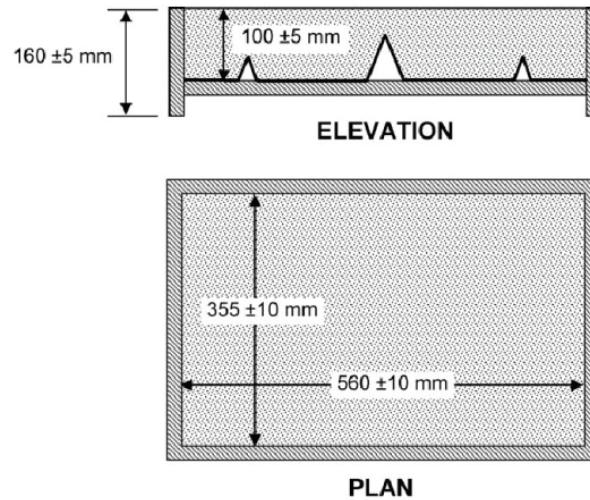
Shrinkage Slab Test Specimen (after ASTM C1579)
